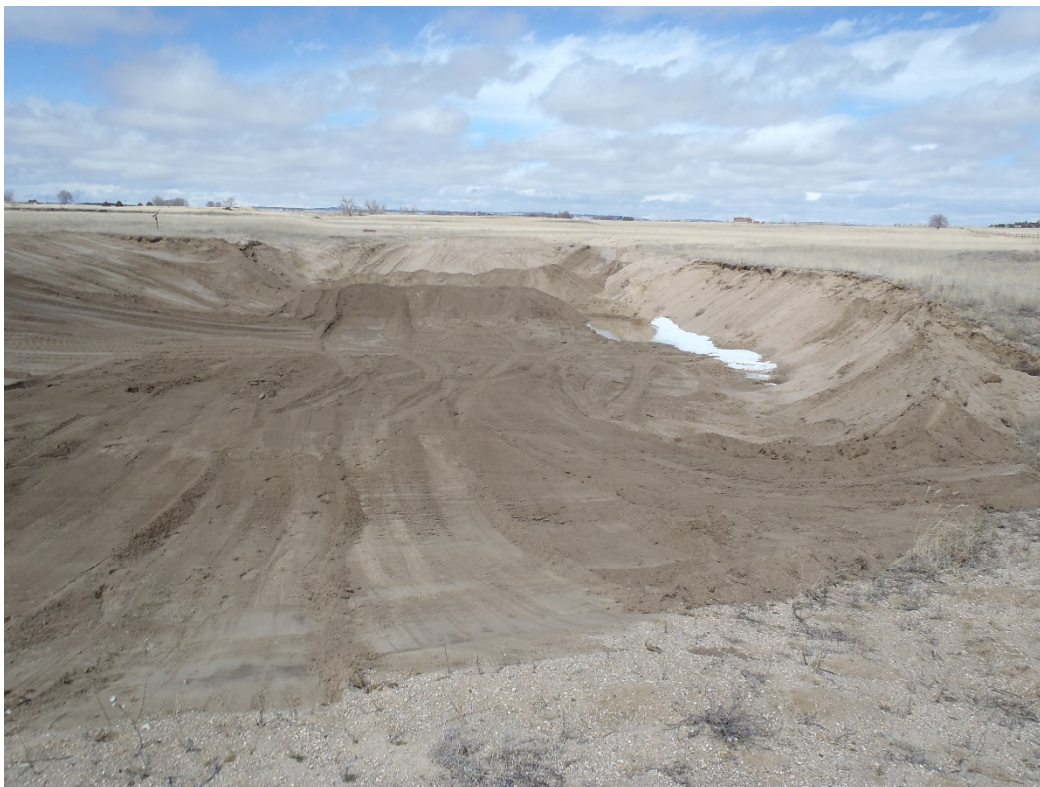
Stable 6 to 8 foot east side highwalls (looking NNW).
